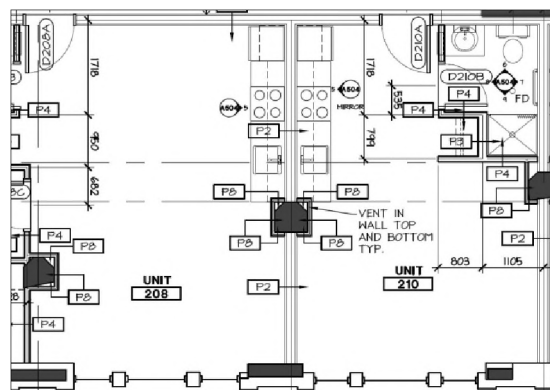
; Floor Plan of Units 208 & 210 Showing Test Wall
